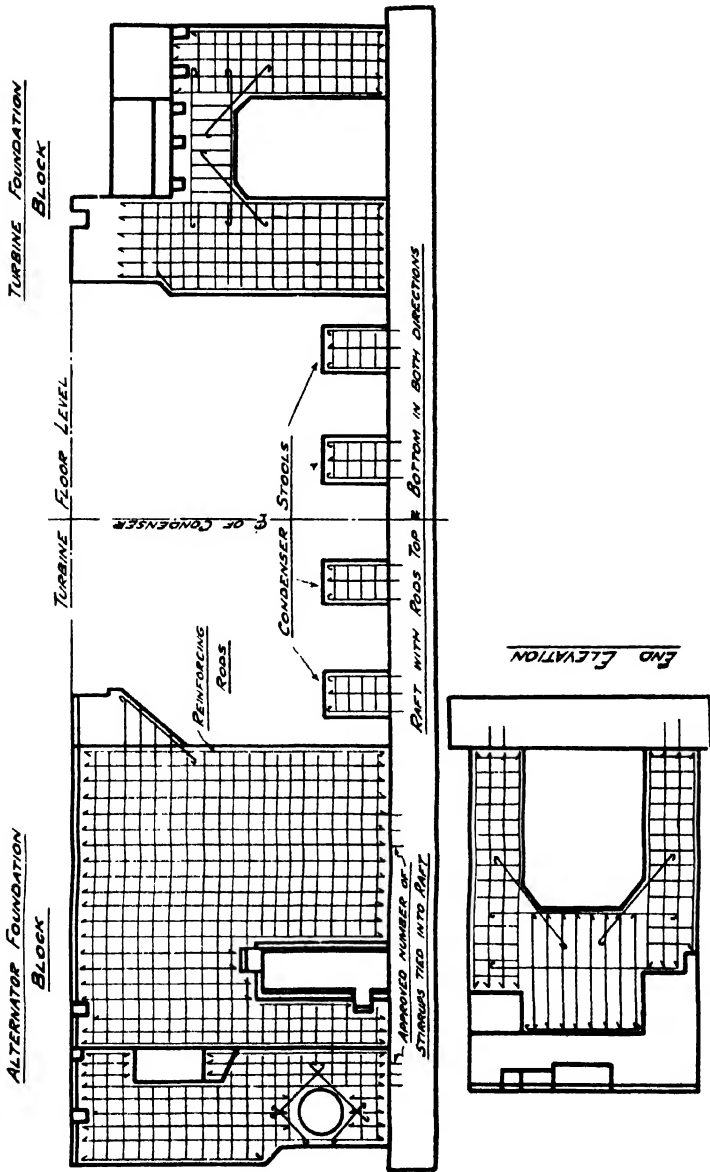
Elevations of Typical Turbo-Alternator Foundation Blocks.
